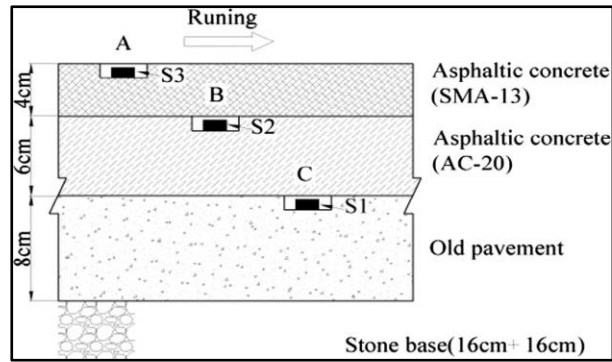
Asphalt pavement cross section showing sensors (Gao, Guo and Liu, 2015)
